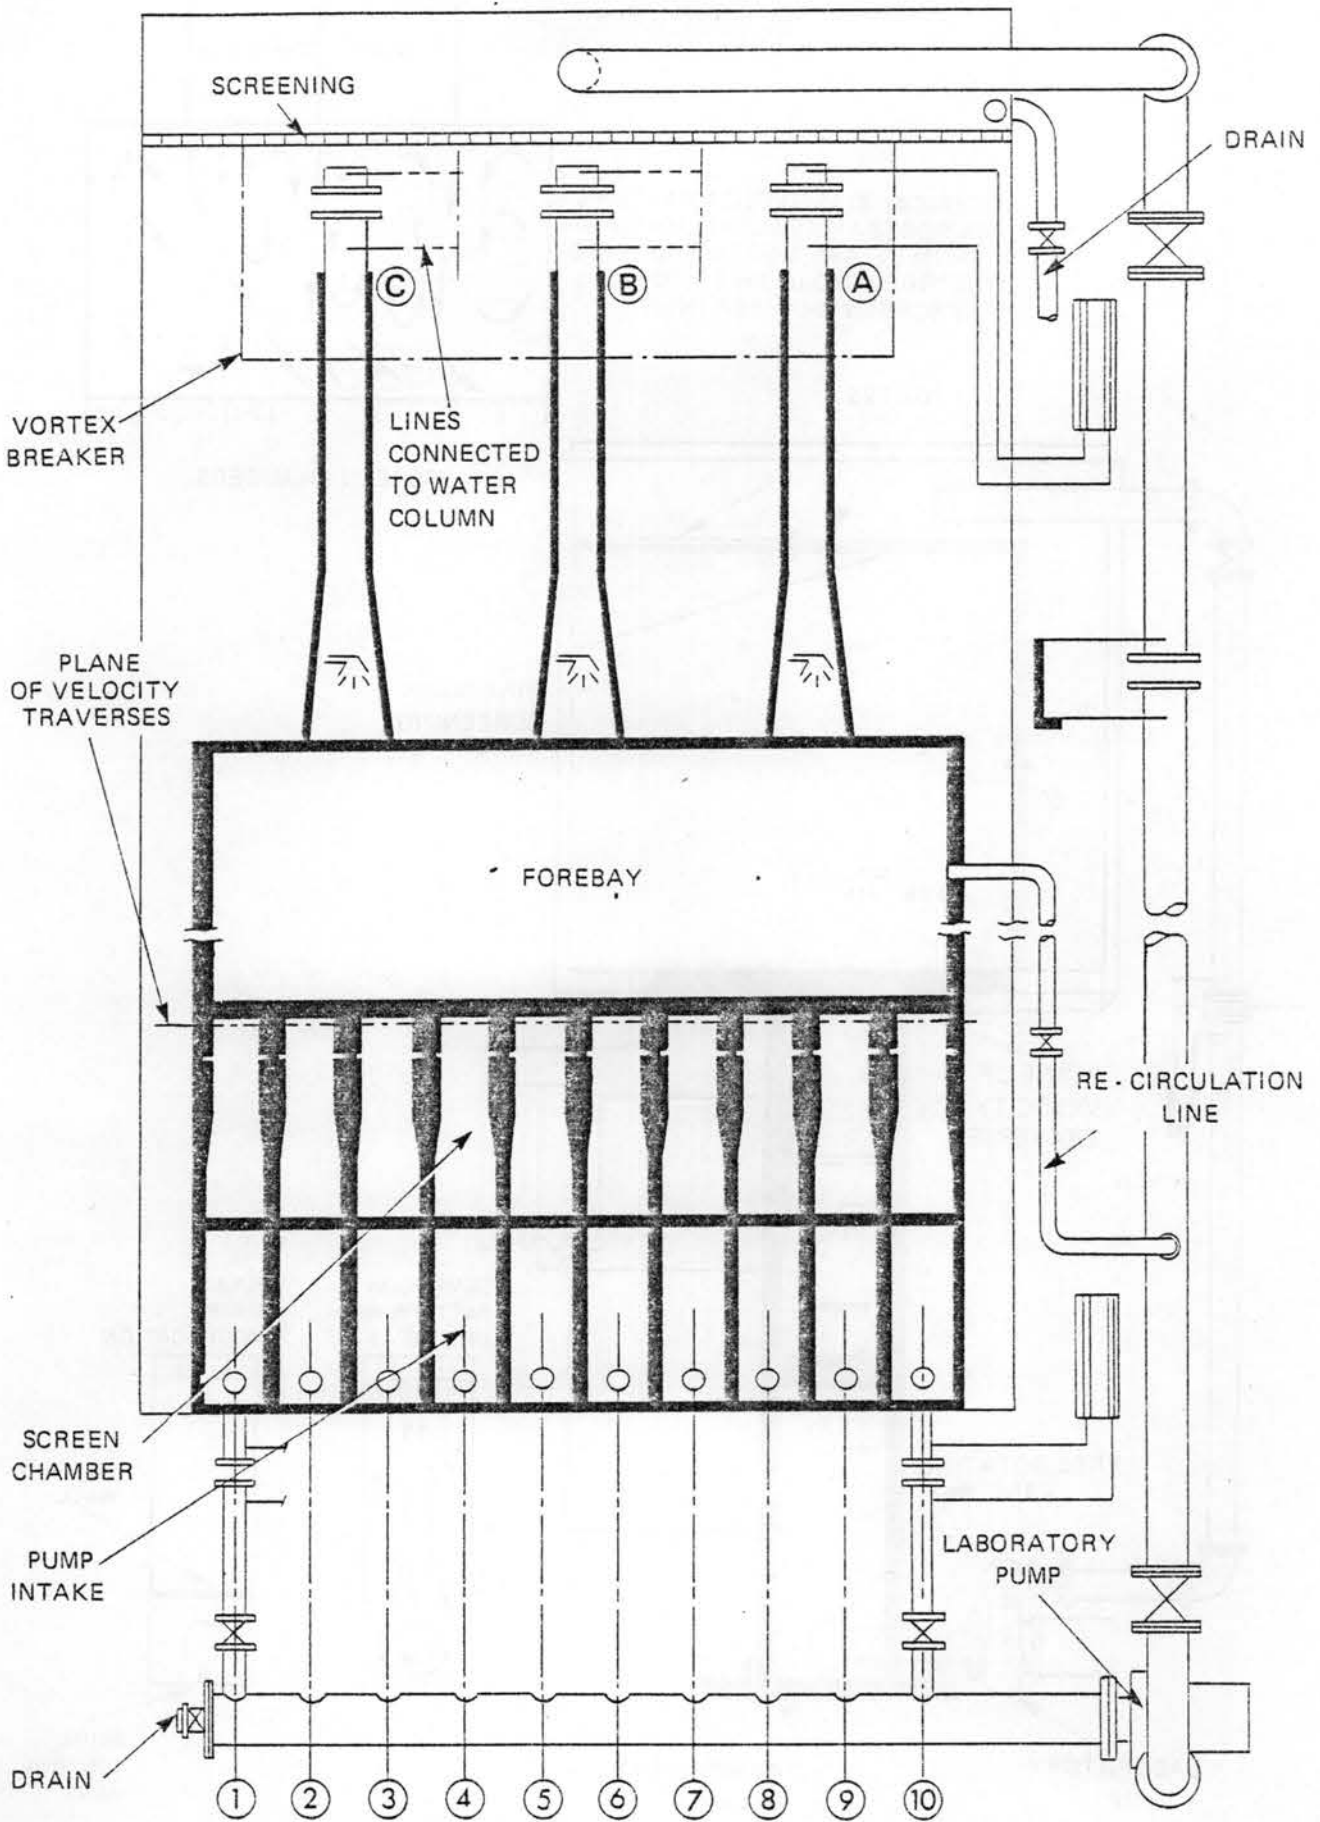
PLAN OF S.W. INTAKE WITH MODEL FACILITY ADDED
